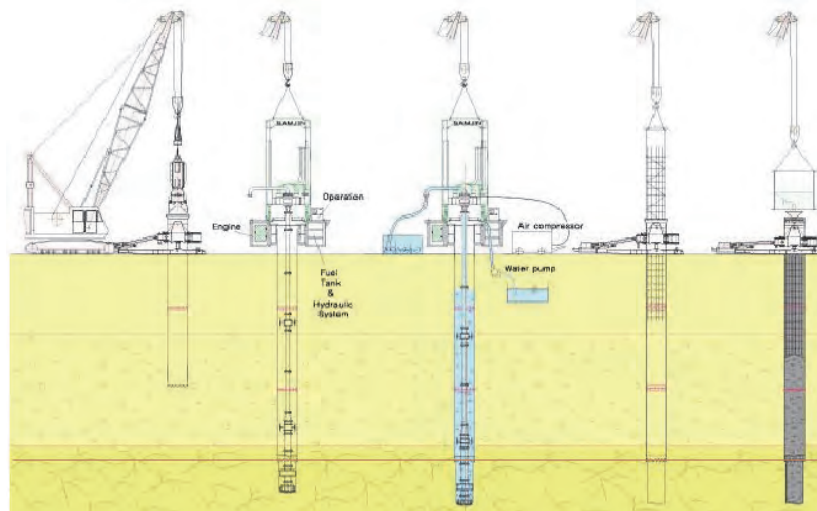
Steps for Cast in Situ Pile Construction on the Land Portion
